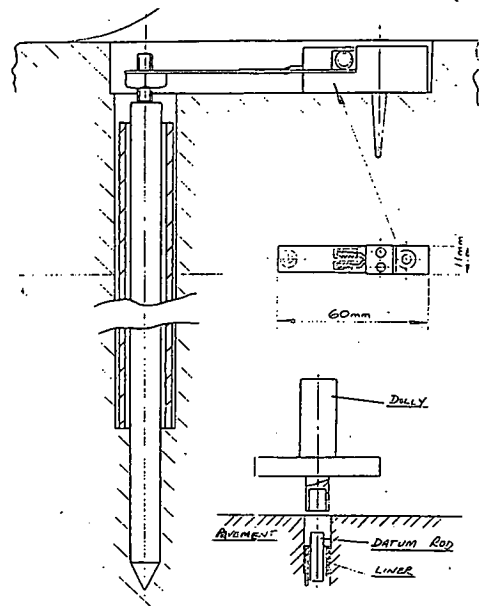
TRL 'spring' deflection gauge used in OECD FORCE full scale pavement test (73).
